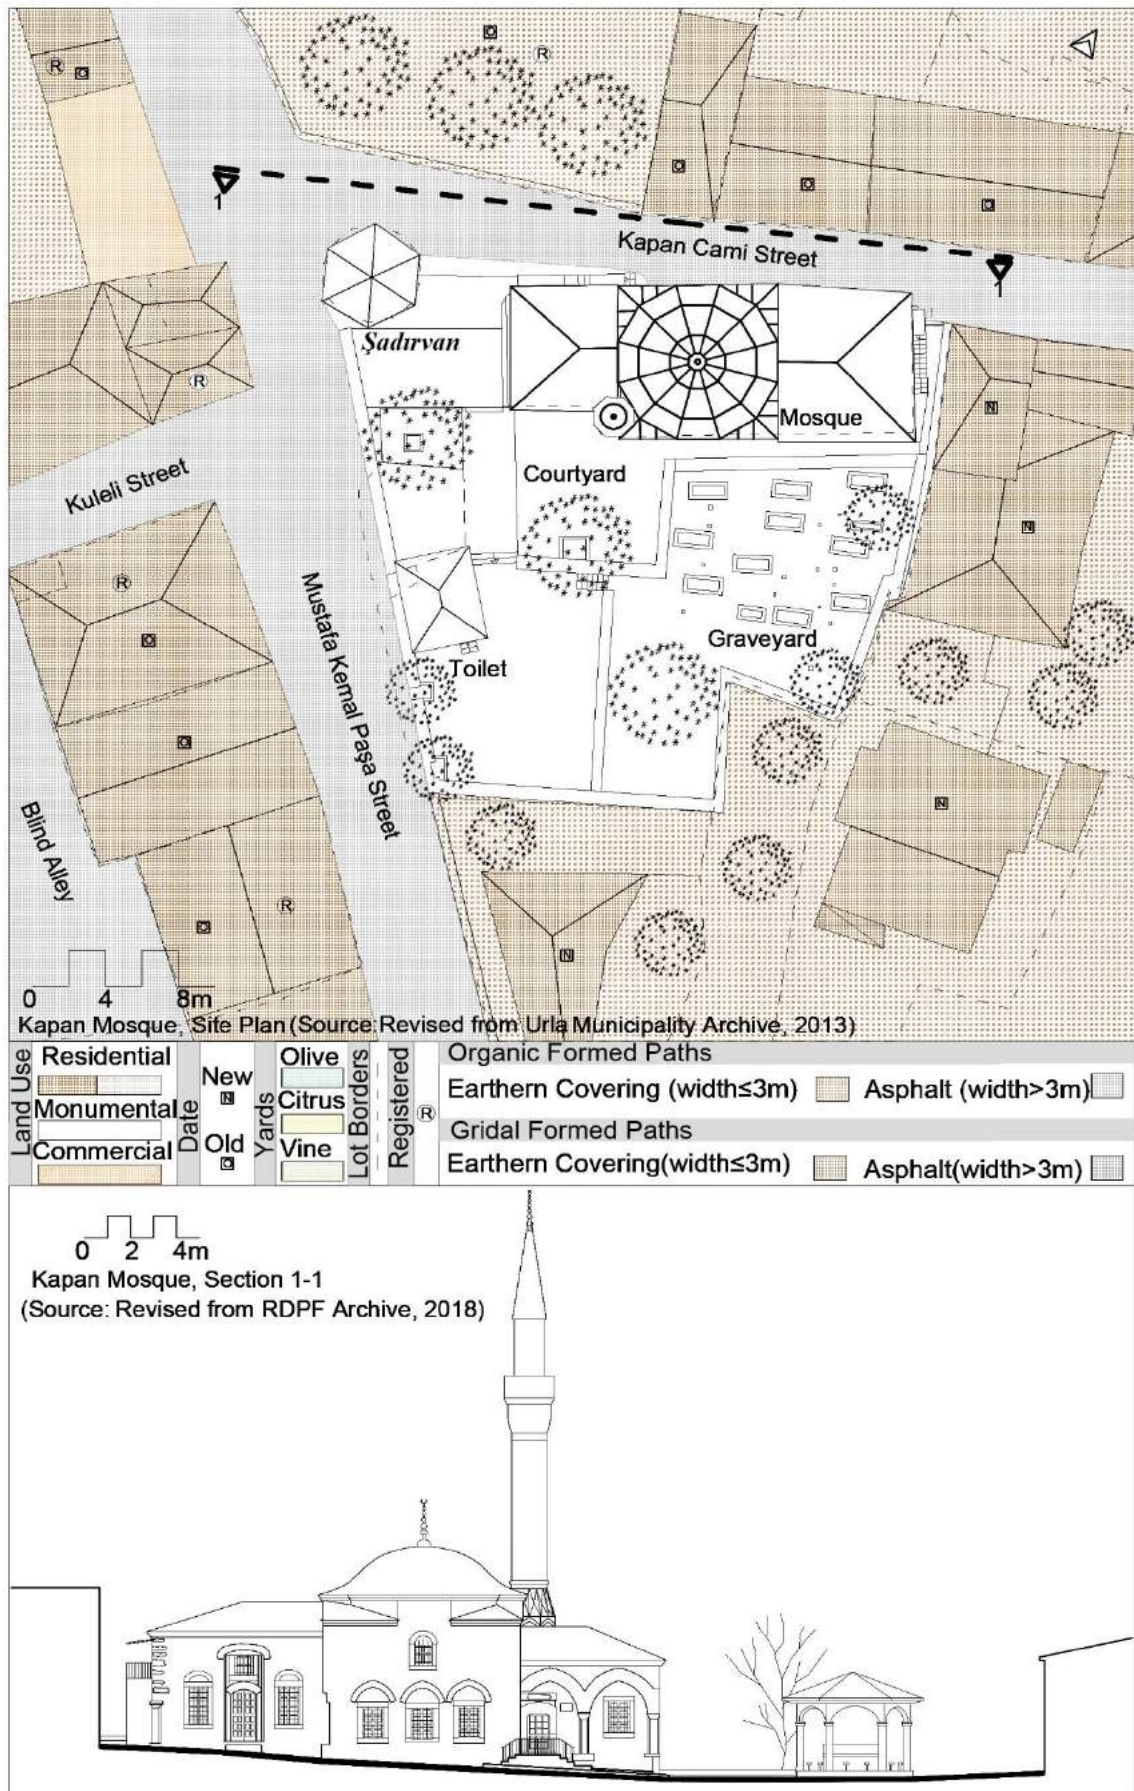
Site plan and silhouette section through Kapan Cami St., Kapan Mosque
